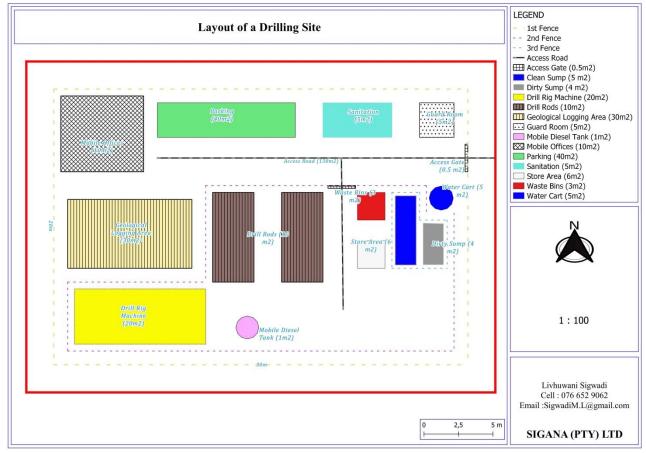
The drill site layout plan showing areas where specific activities will take place in the project area
